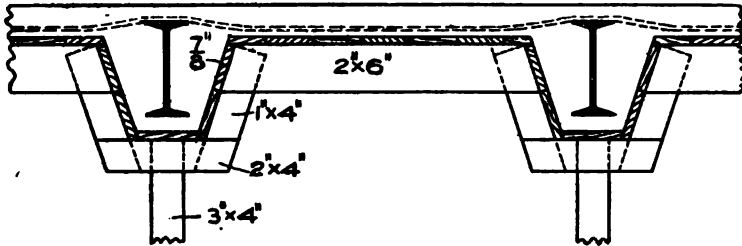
Forms for Reinforced Concrete Slab Supported by I-beams.
